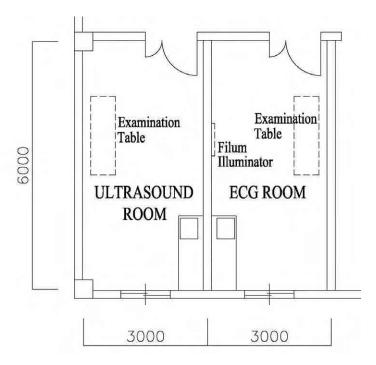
Plans of Ultrasound Room and ECG Room
